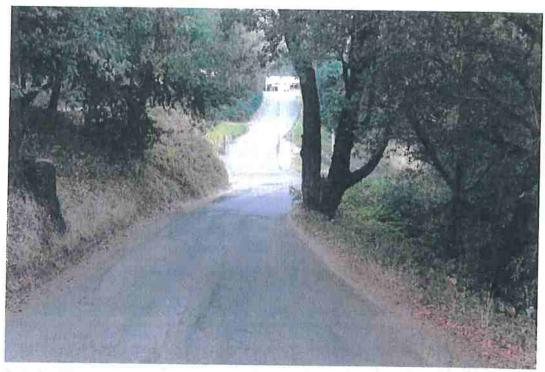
Mile 0.45: Pinch point at tree, 16-ft road width, decent visibility.
